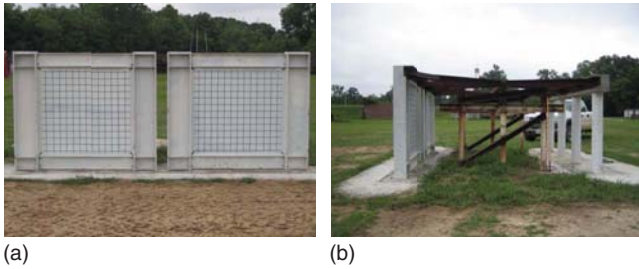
Photographs of the SPSW specimens installed at test site: (a) elevation; (b) side view showing reaction frame
